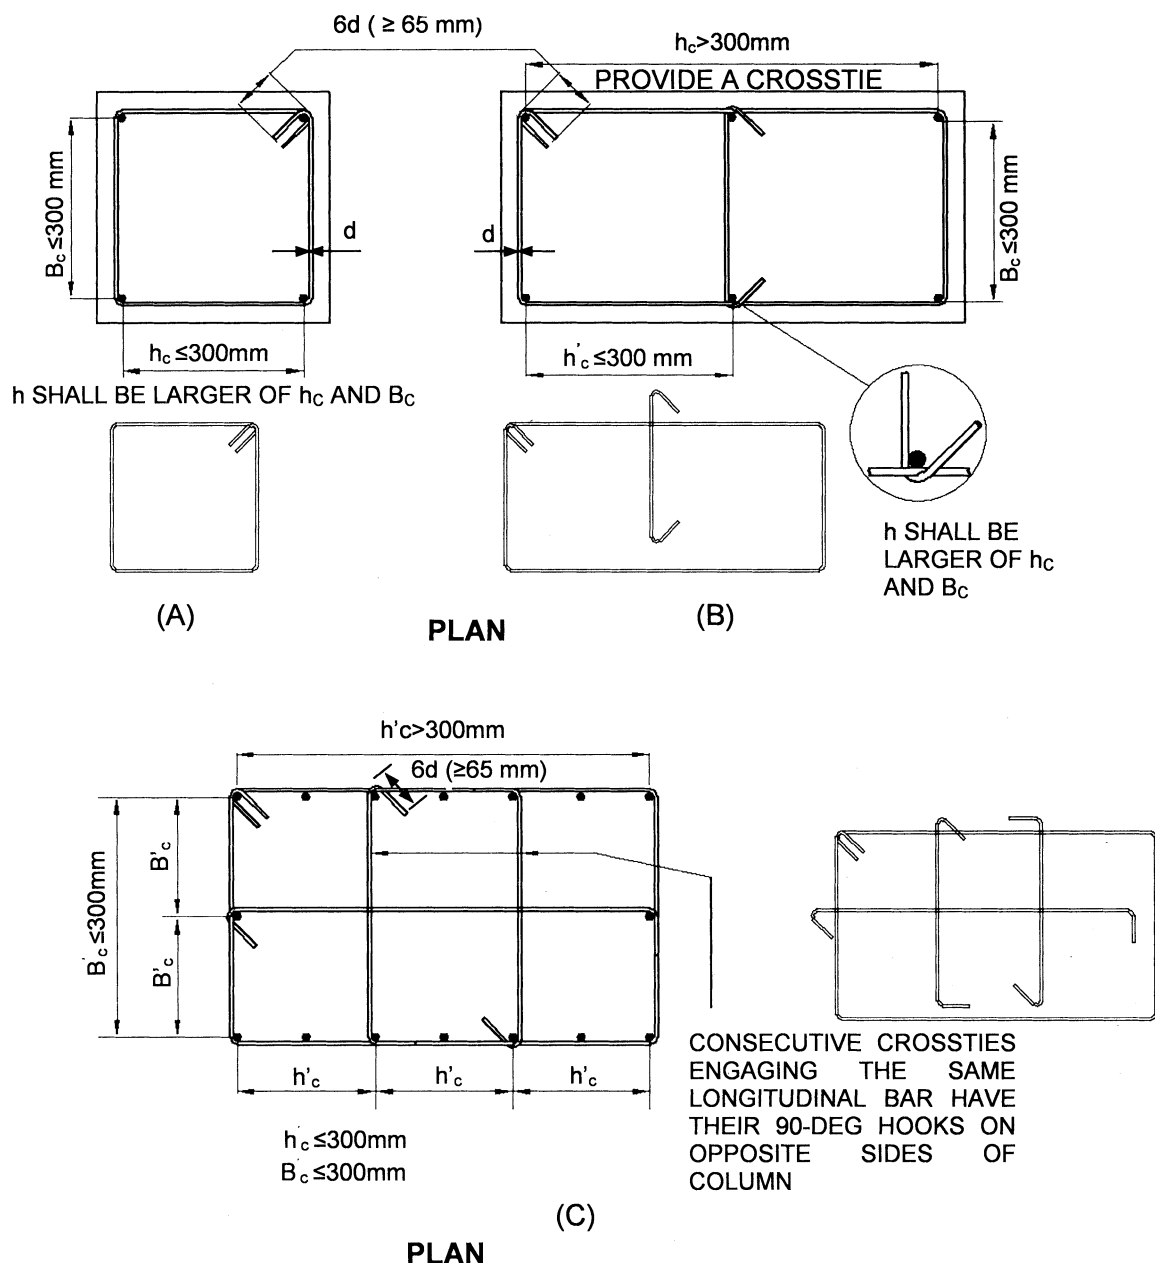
DETAIL OF TRANSVERSE REINFORCEMENT IN COLUMNS
